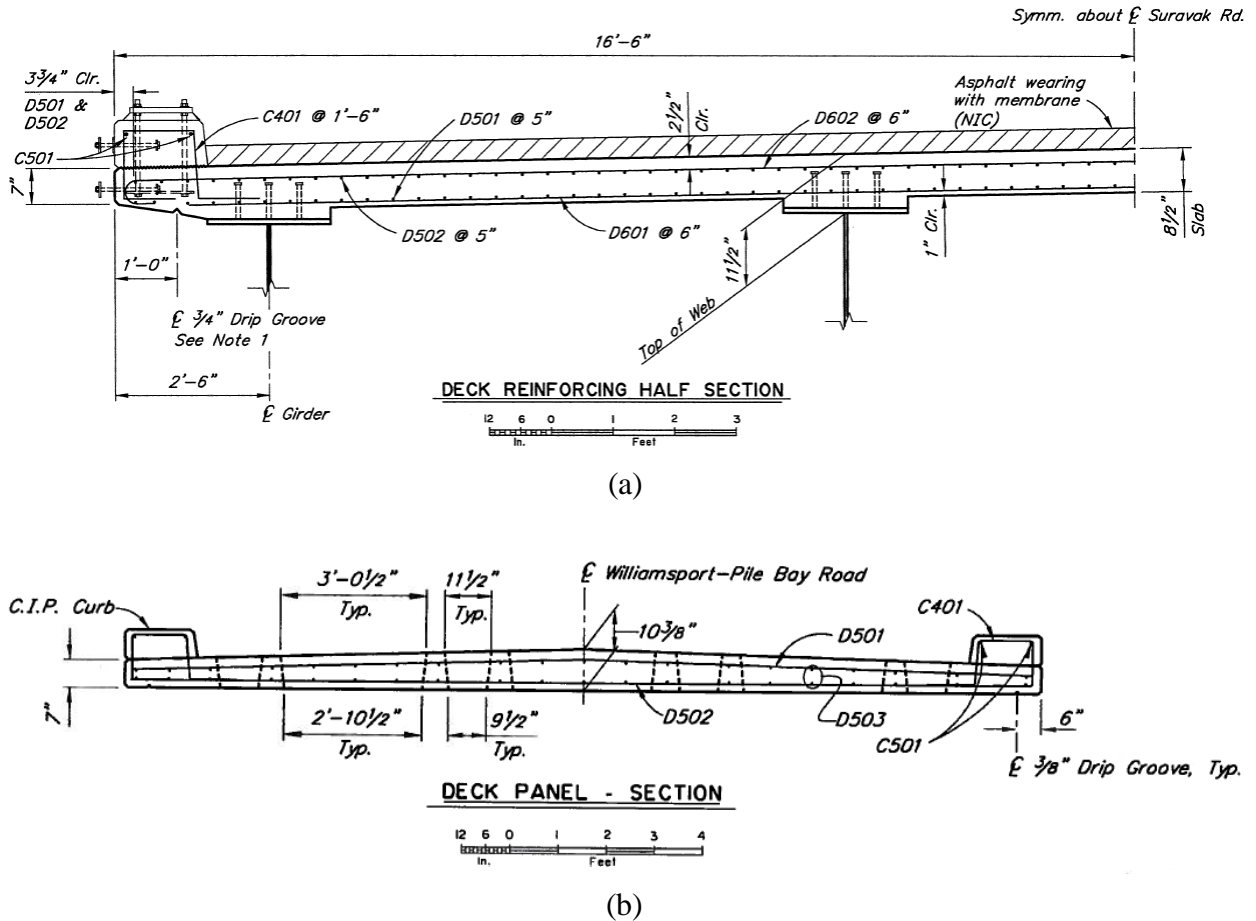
Typical deck details for Alaska: (a) CIP deck and (b) FDPC deck
